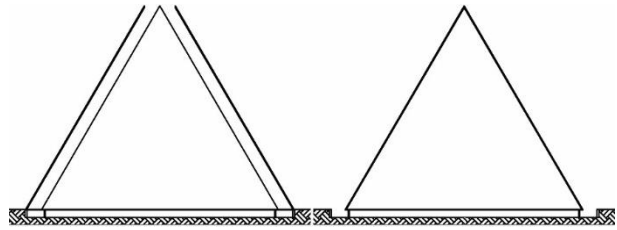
Diagram of building expansion in summer and shrinkage in winter
